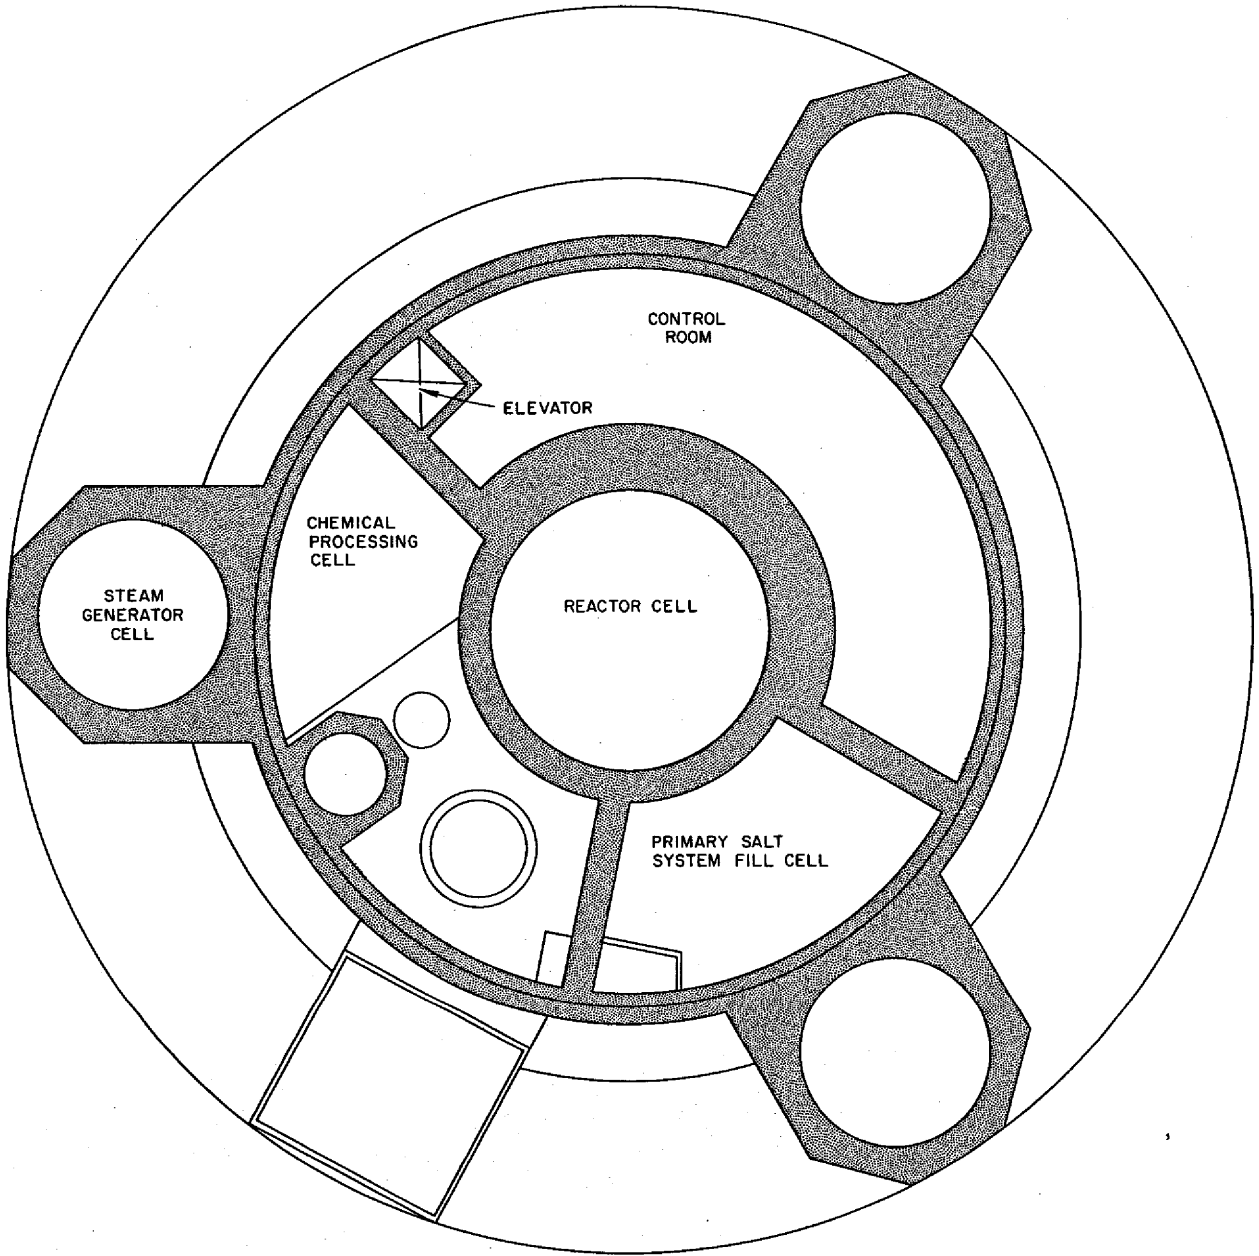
Plan View, Third Floor of Confinement Building, Section CC.
